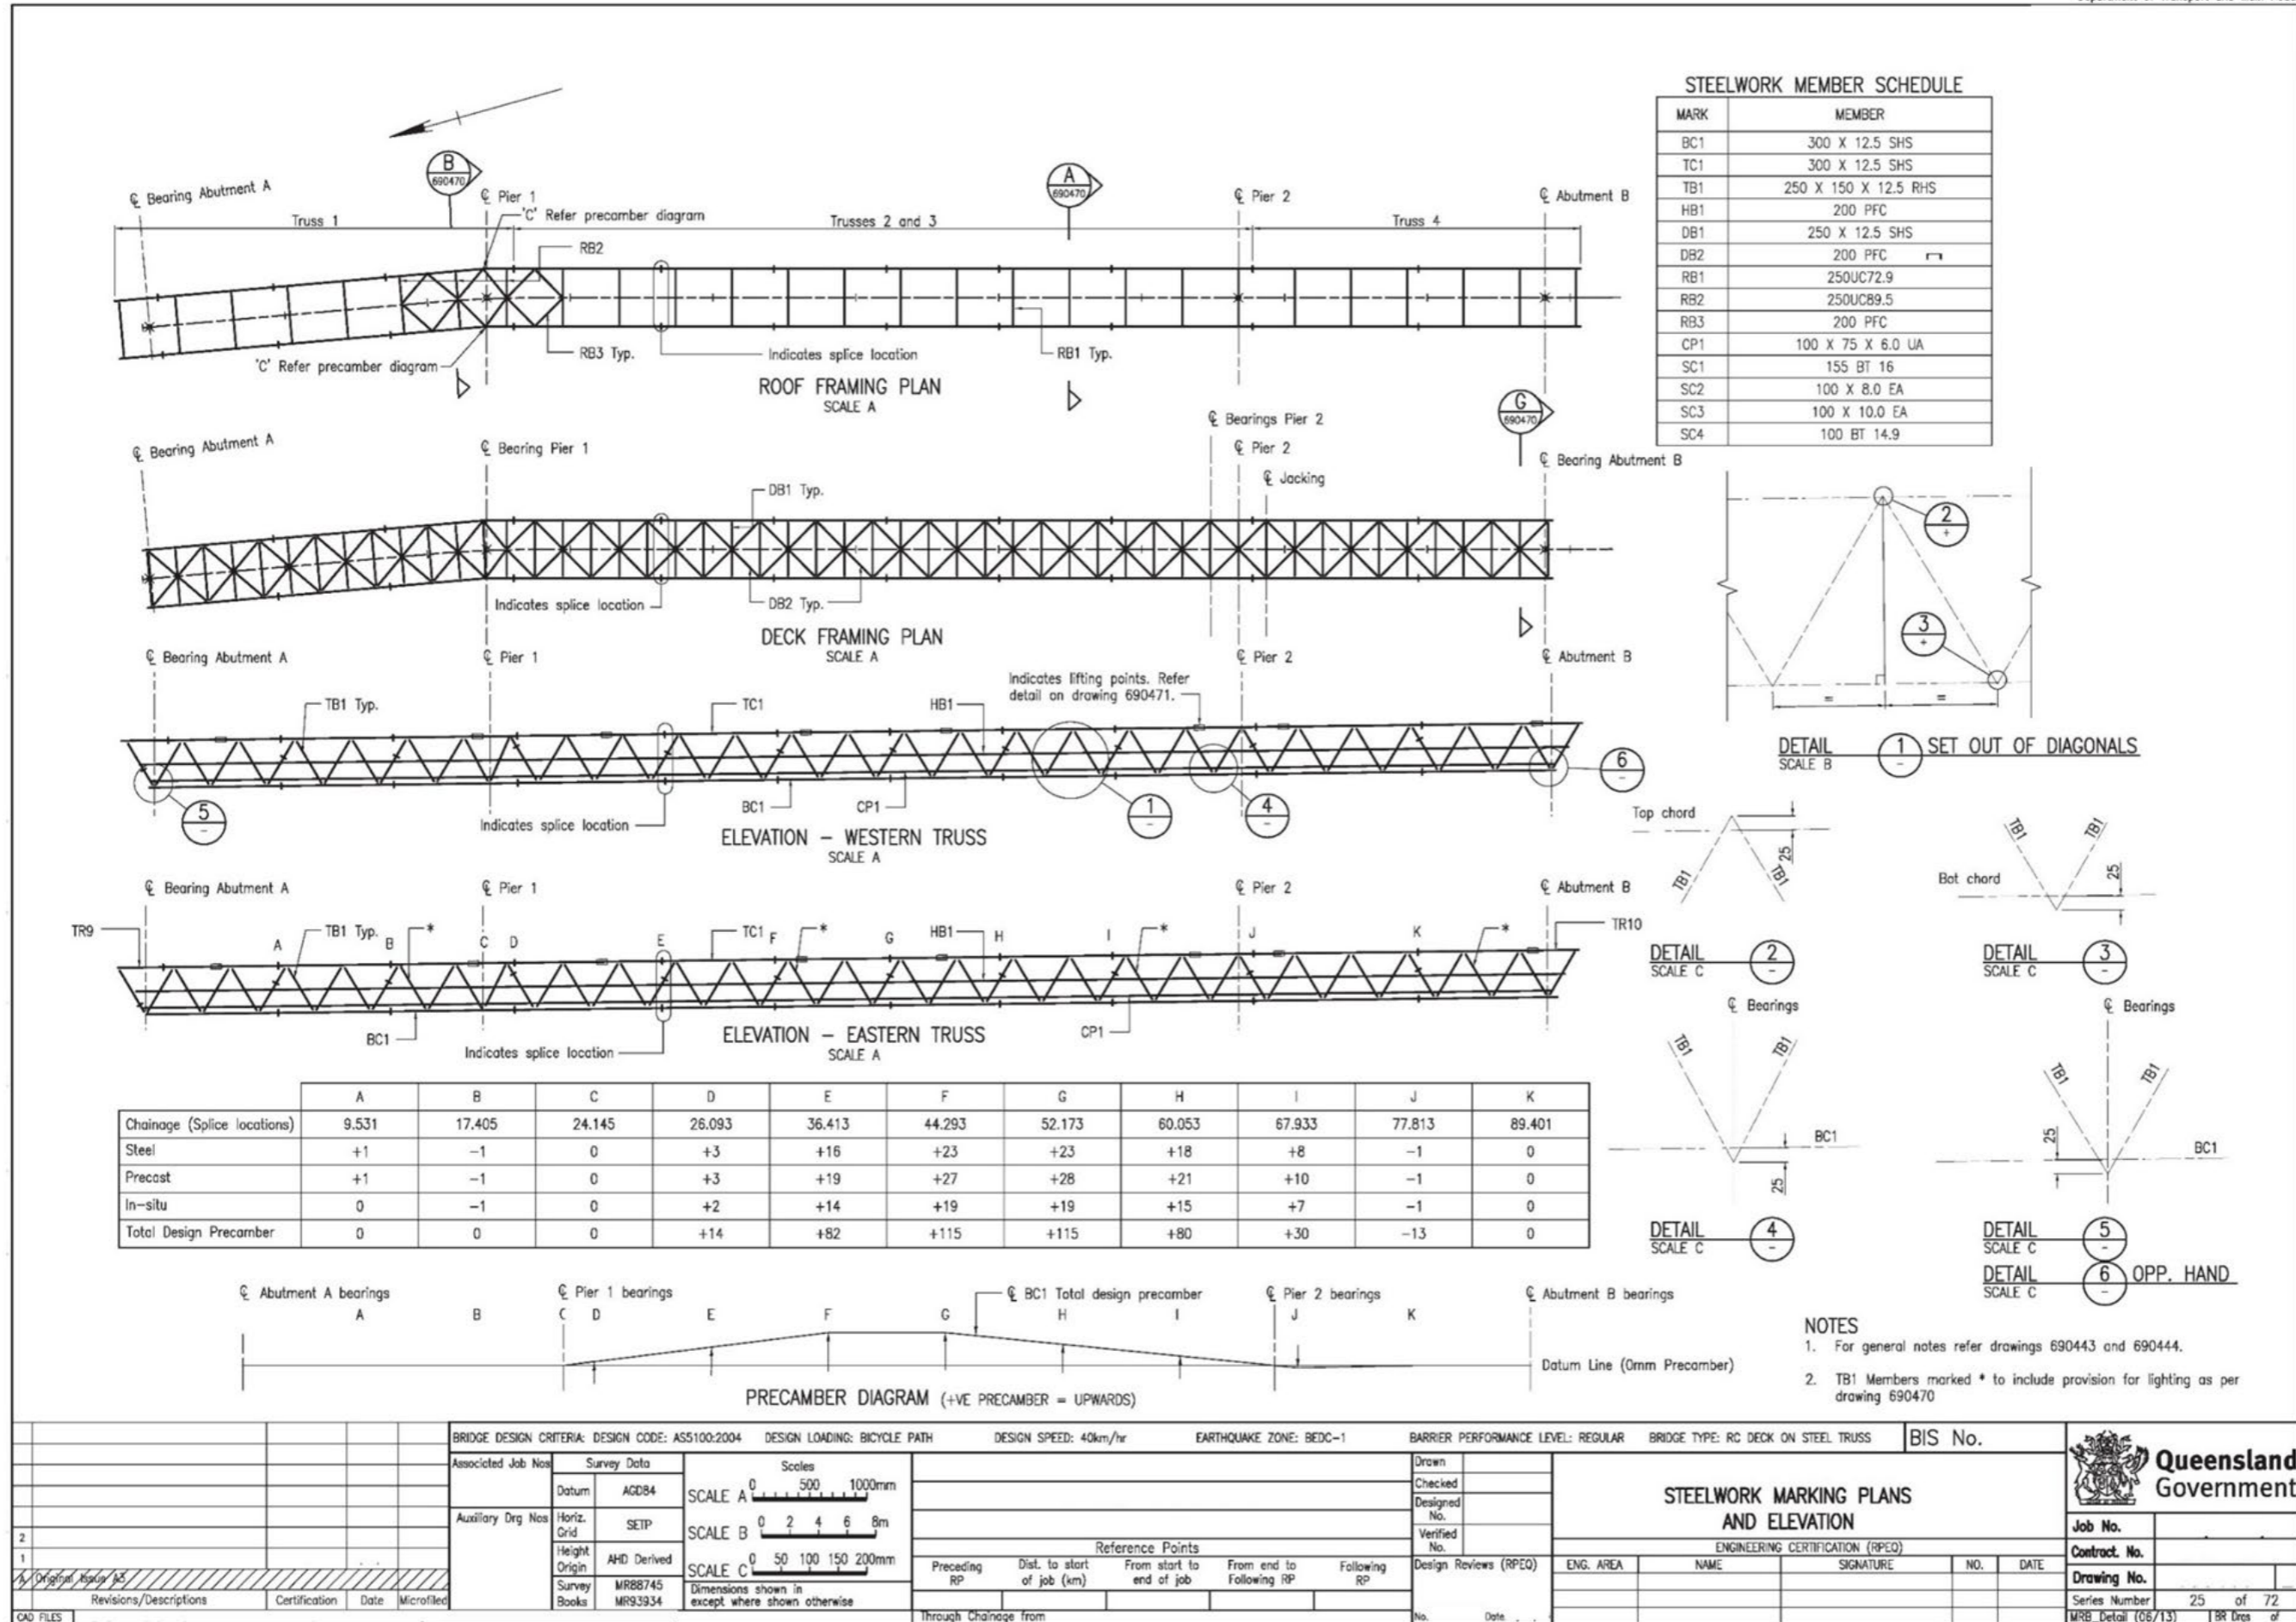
(b) - Example drawing of steelwork plan views and elevations of truss
